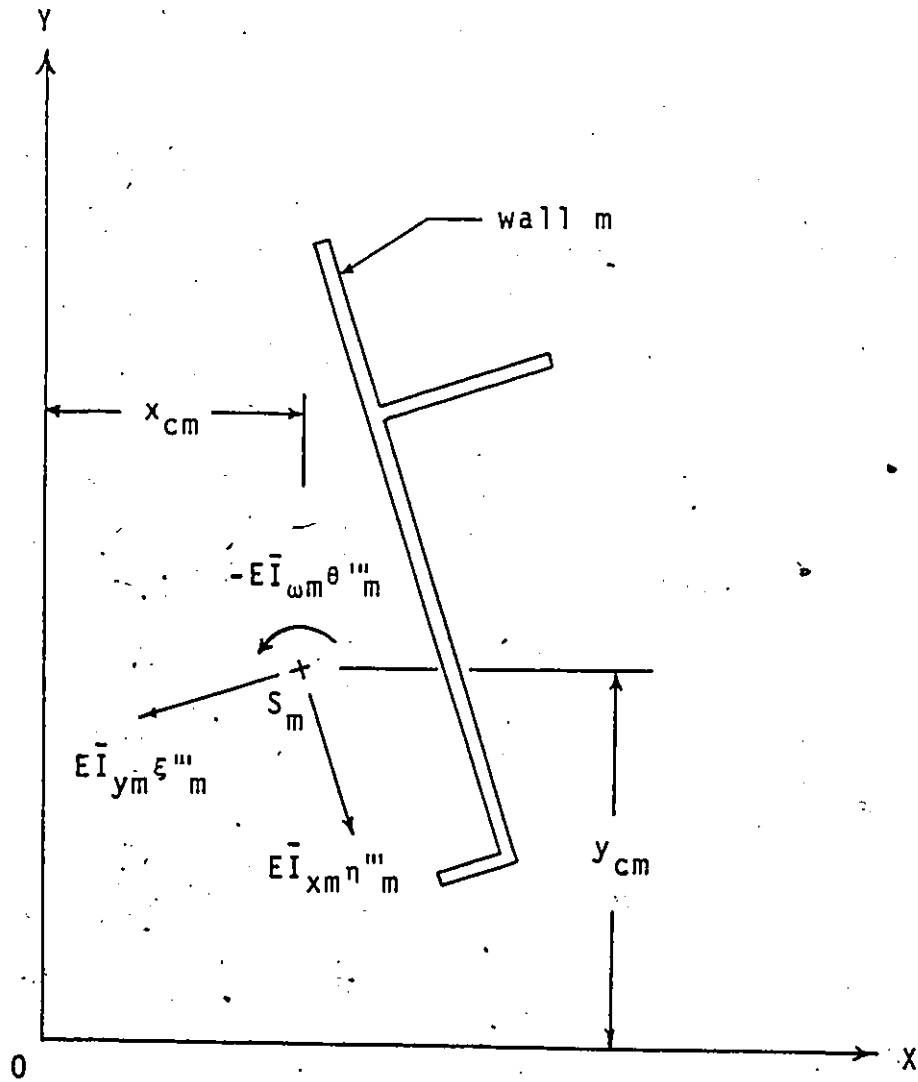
SHEAR FORCES AND TORQUE ACTING ON WALL m
